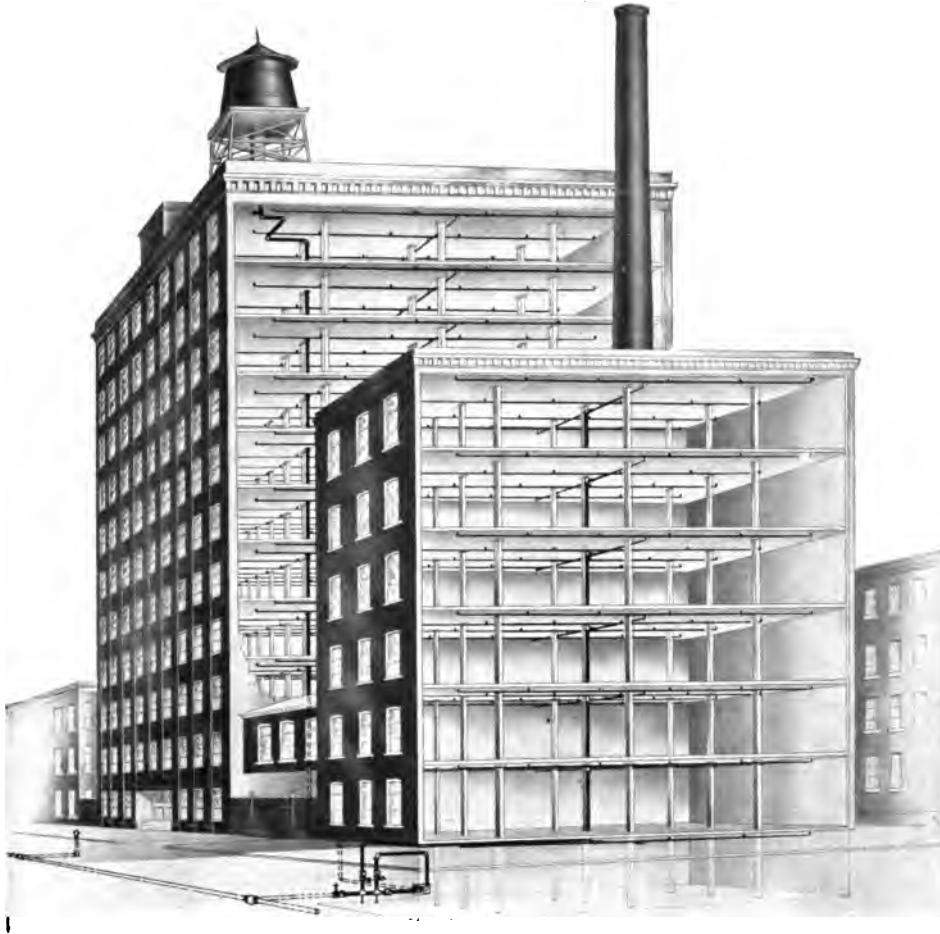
Sectional view of buildings equipped with automatic sprinklers.
